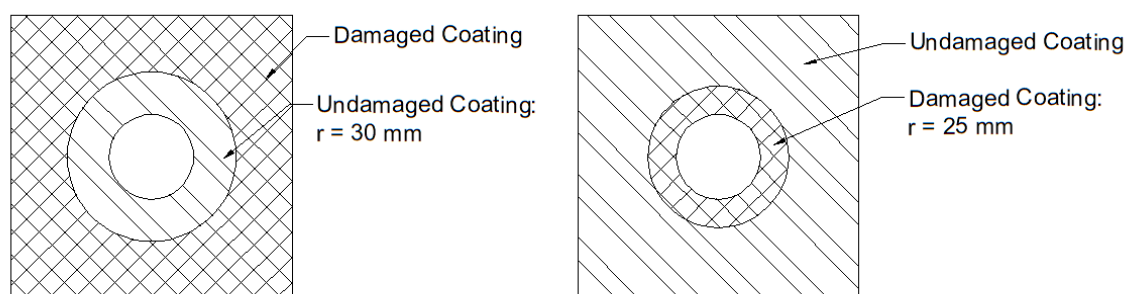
Damage to the coating after proposed fatigue test: Left) Inside cover plate; Right) Outside cover plate
